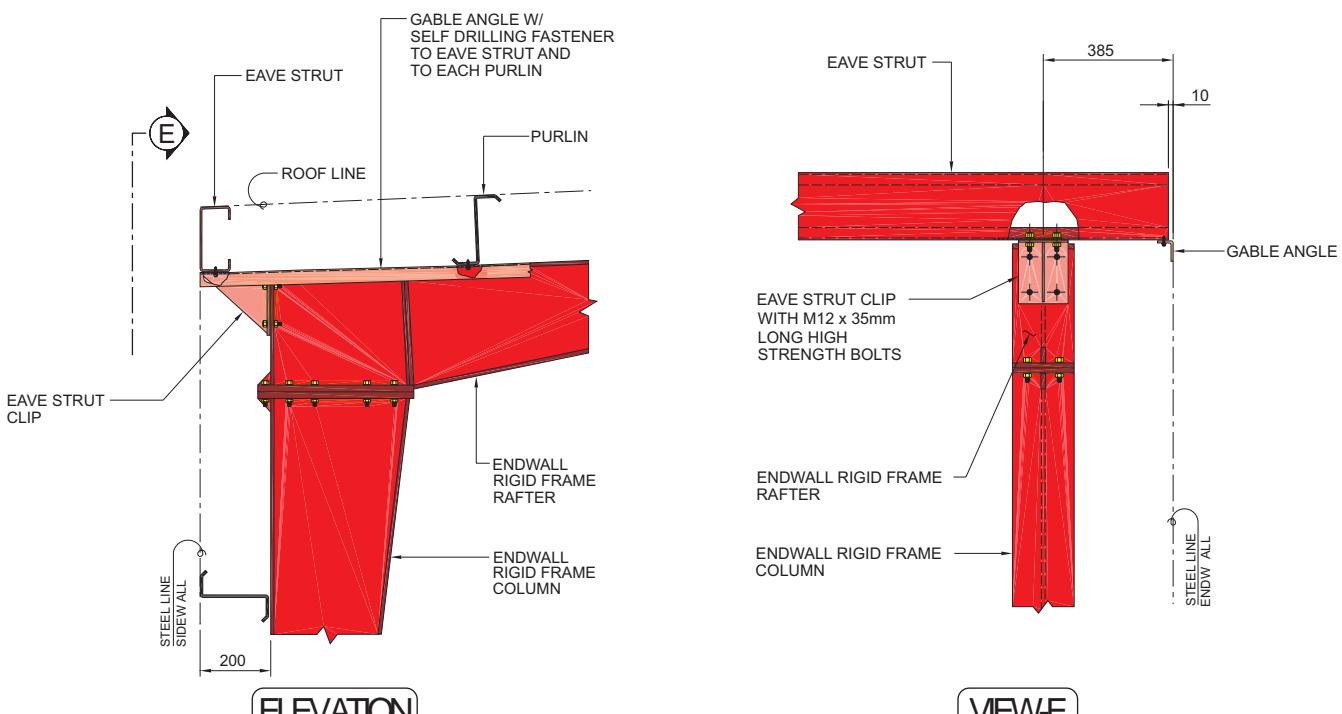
CORNER CONNECTION AT GIRT OF RIGID FRAME ENDWALL
